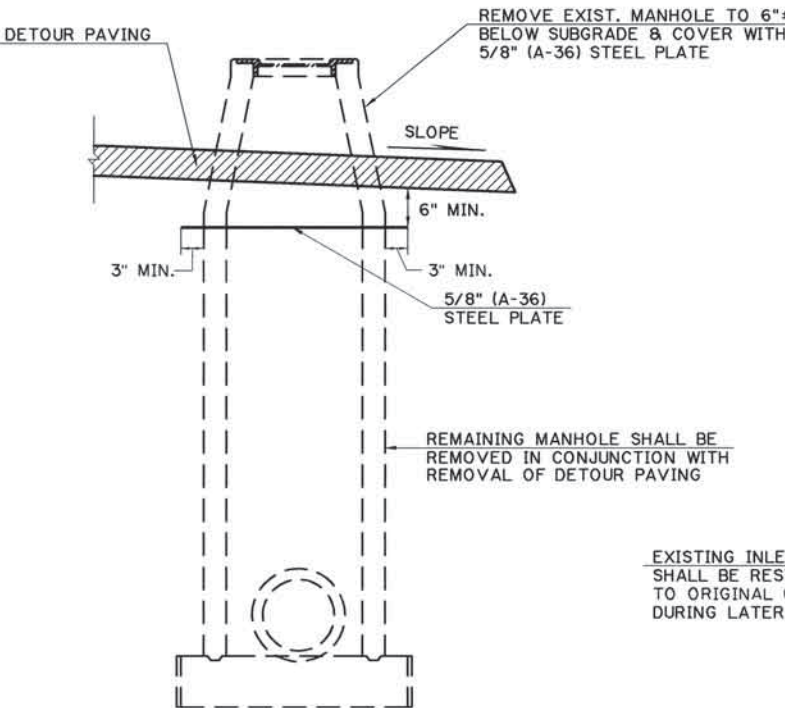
DETAIL OF PROPOSED MANHOLE CONSTRUCTION DURING DETOUR PHASING
